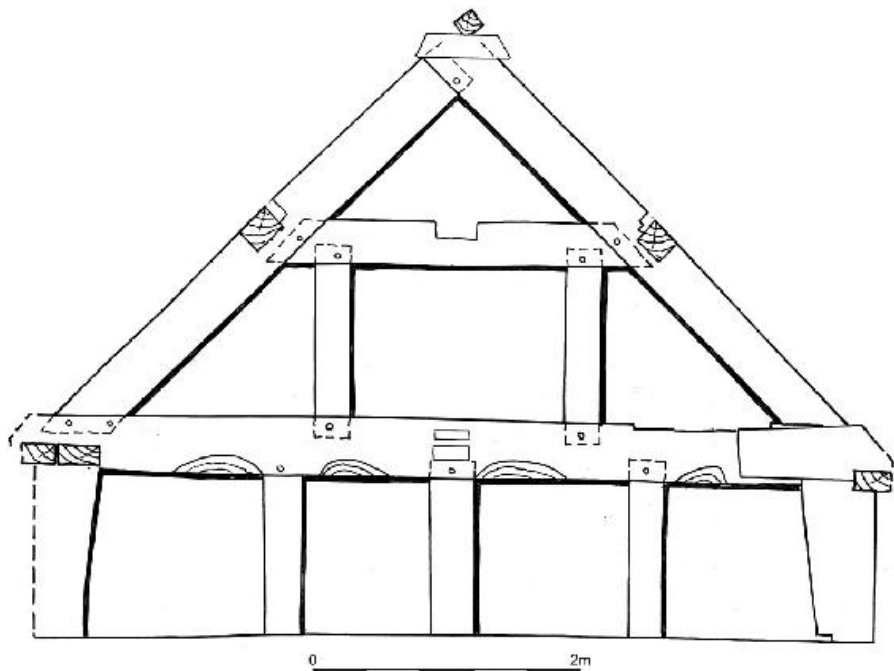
The plain gable trusses of the frontage block of 14 Church Street contrasted with the more decorative dormer gables to the street
